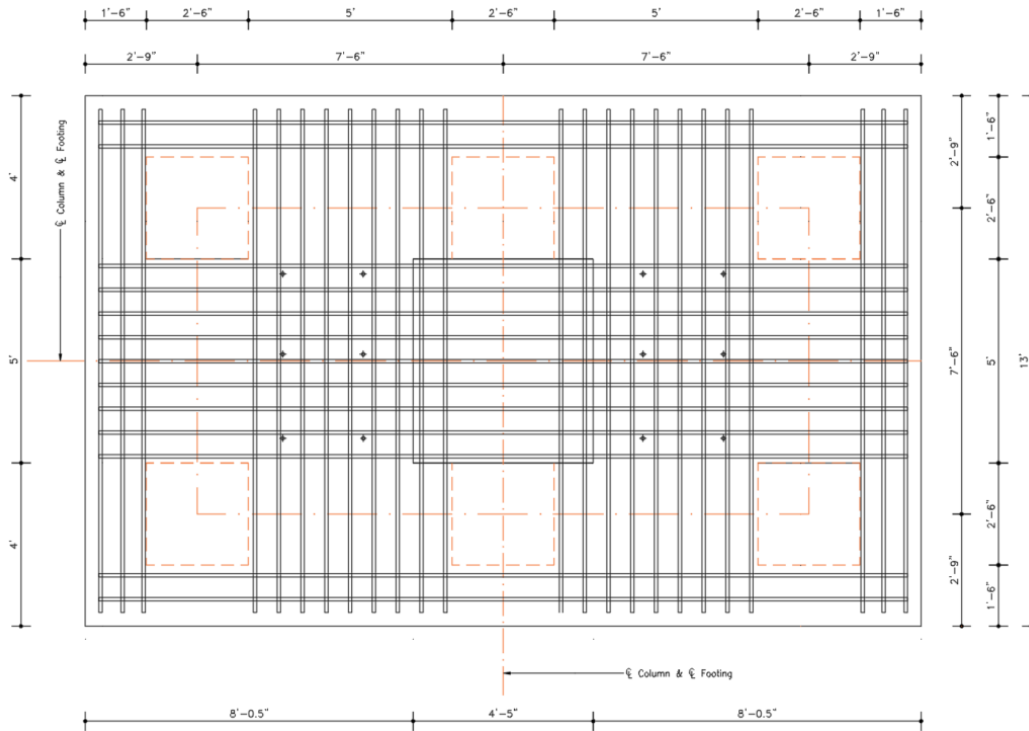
GFRP reinforcement layout (bottom reinforcement) – Pile cap 6-pile group “B” of the selected Pier n.24 of the Eastbound Bridge
